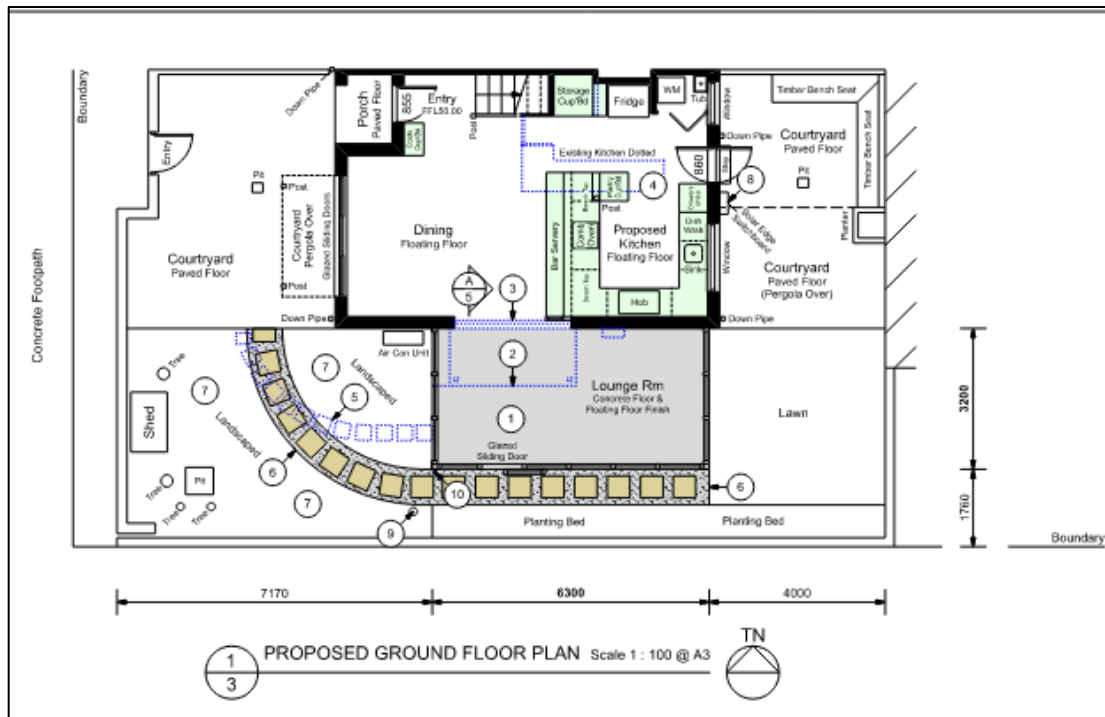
Proposed Ground Plan (Source: Red Rock Design).
